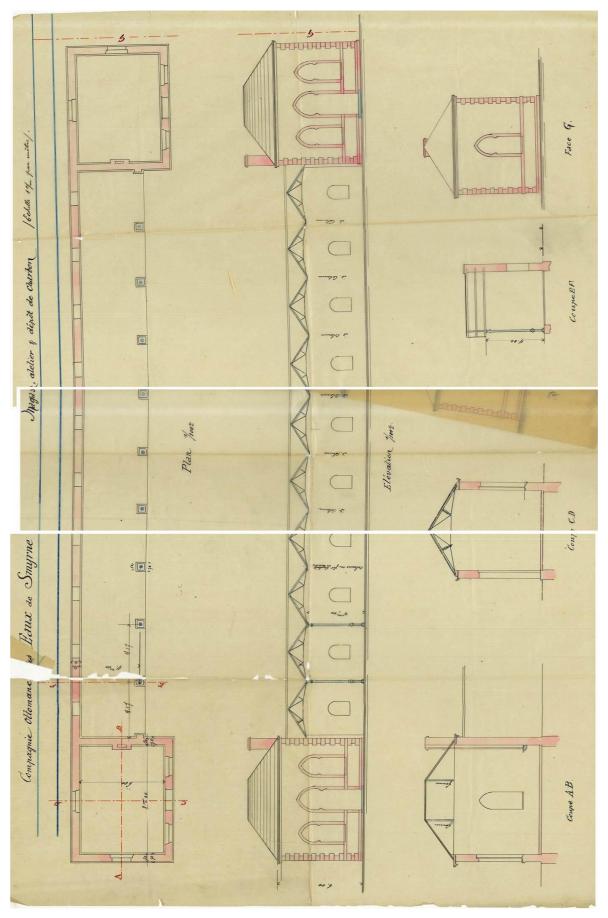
4. Outbuildings facades in 1898 (İZSU Archive).
